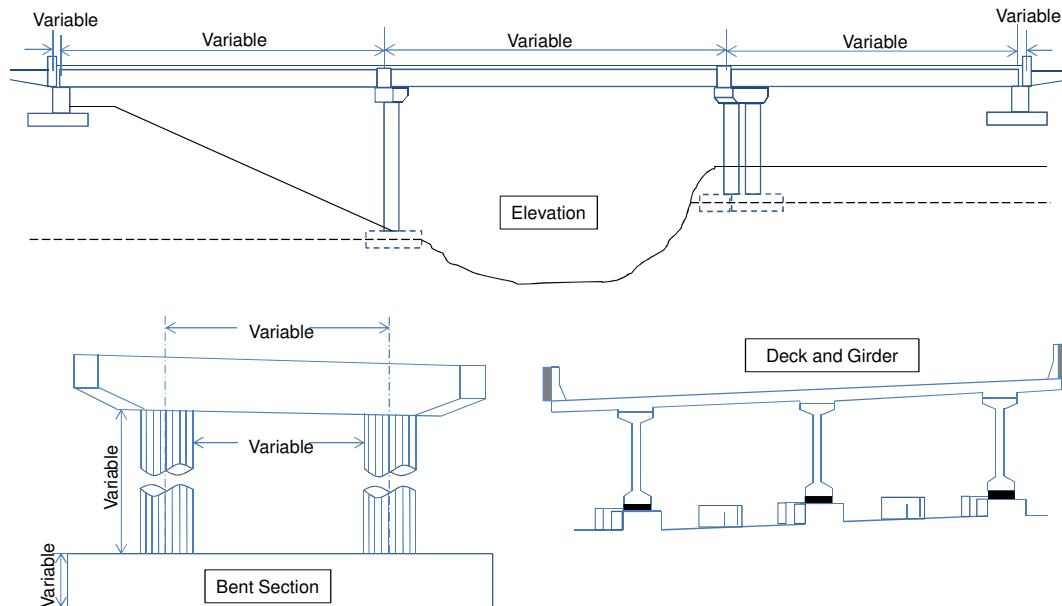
Configuration of a typical MSCC girder bridge in British Columbia
